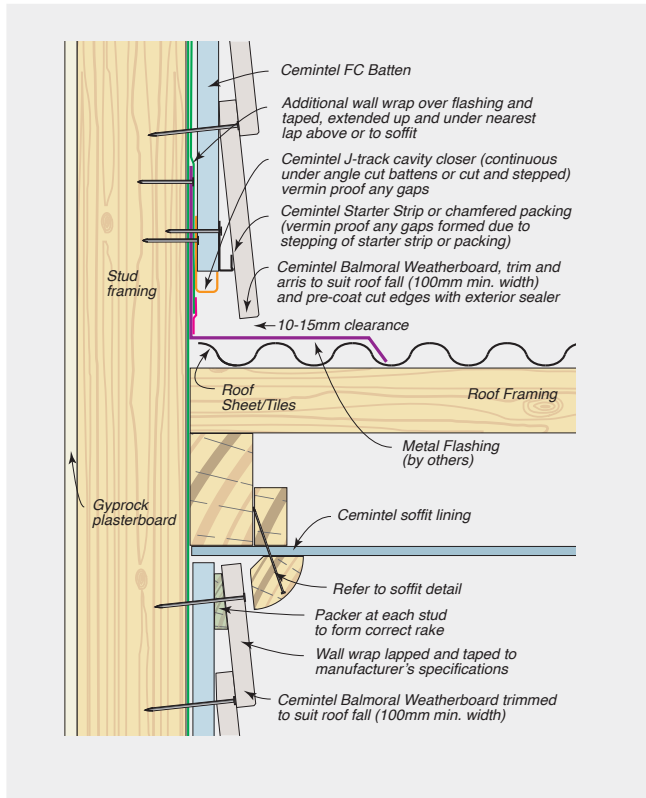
Typical Junction of Cladding with External Roofing
